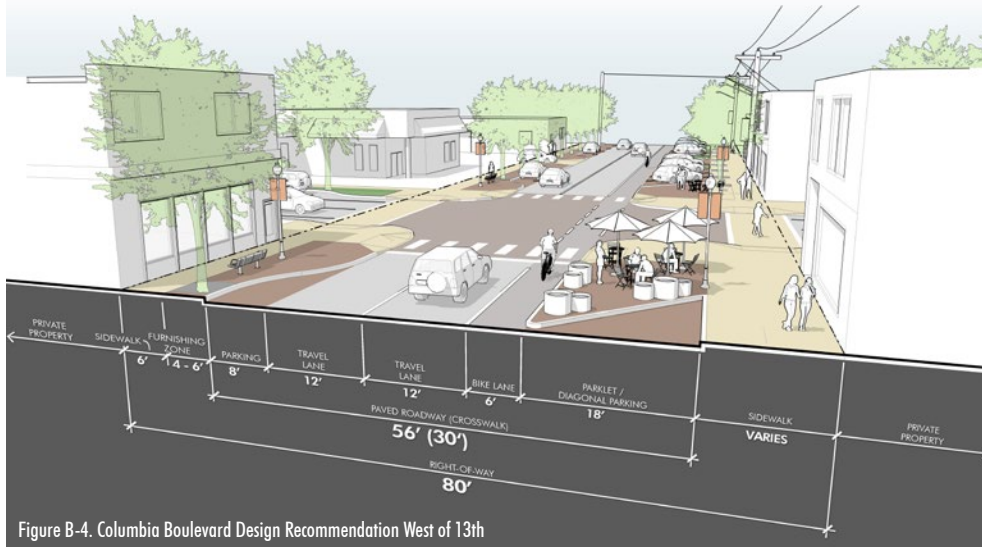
Columbia Boulevard Design Recommendation West of 13th
